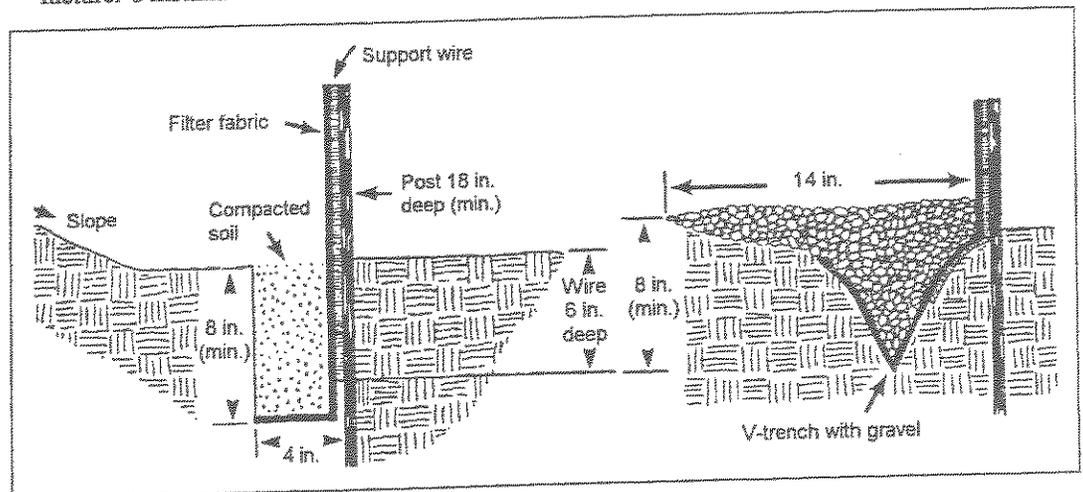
E. Detailed example of silt fence installation (showing flat-bottom and V-shaped trenches).
